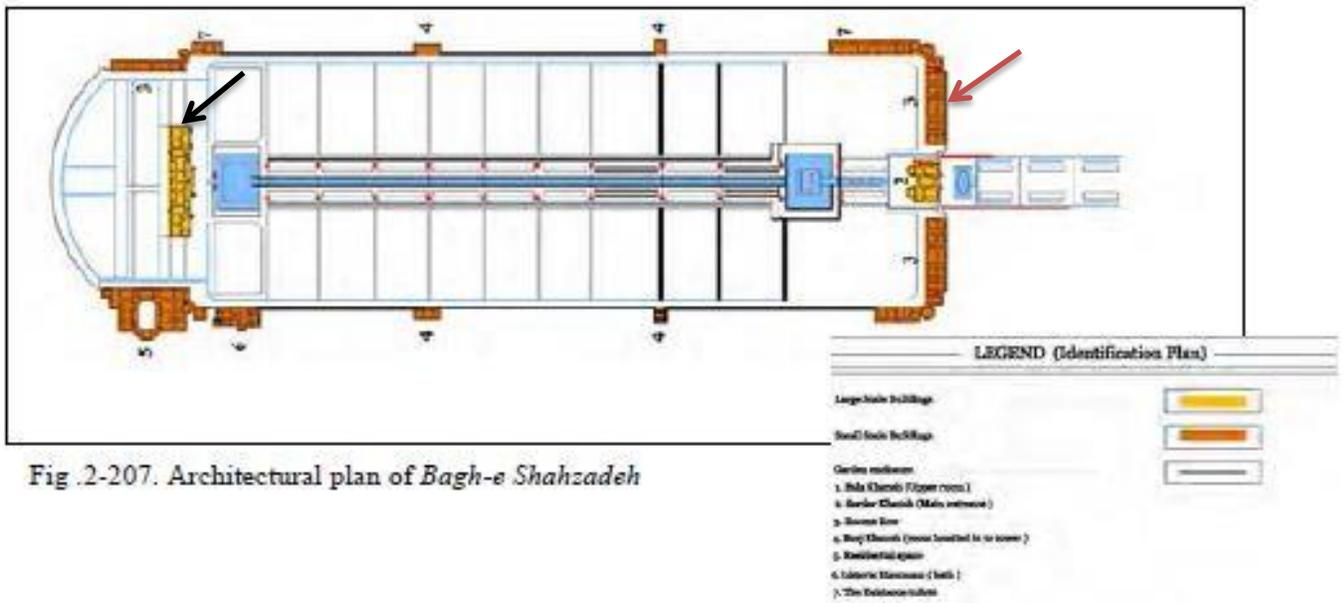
Architectural plan of *Bagh-e Shahzadeh
